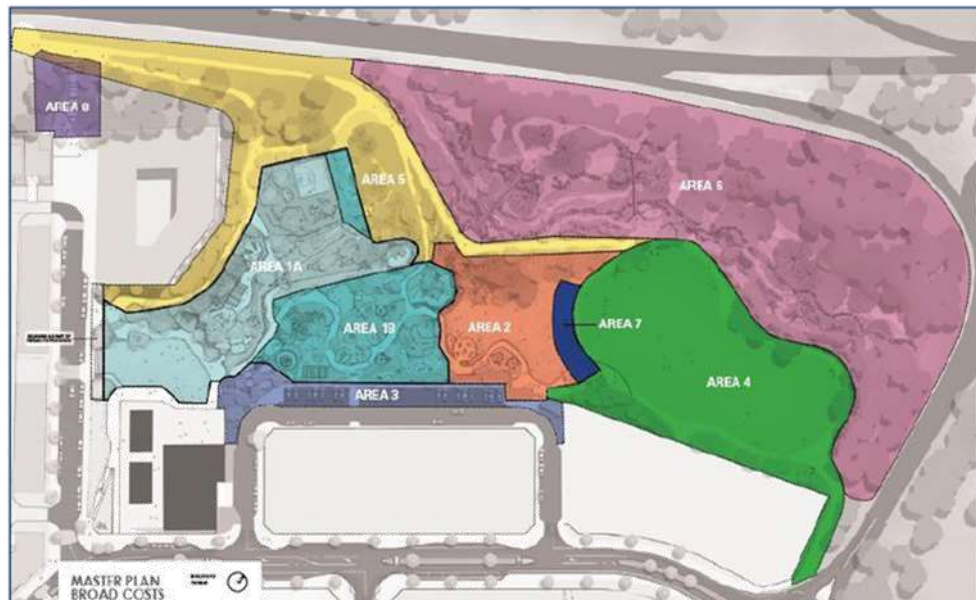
Stages of public open space construction (concept design by Playstreet)
